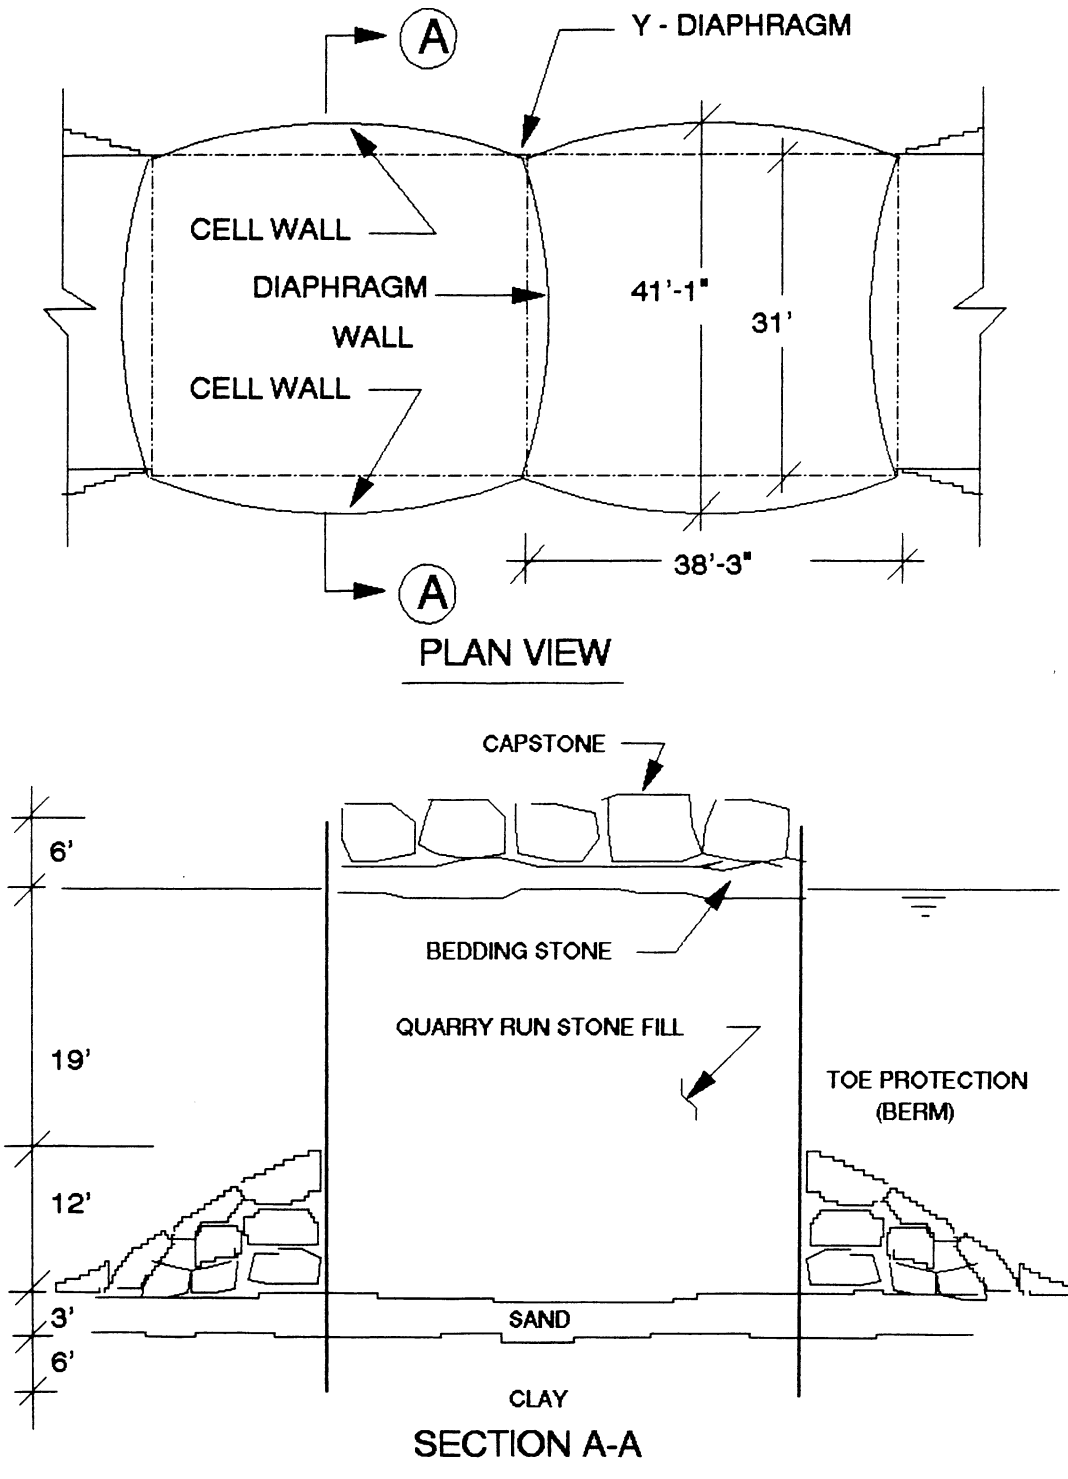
Sectional elevation and plan view of breakwater cells
